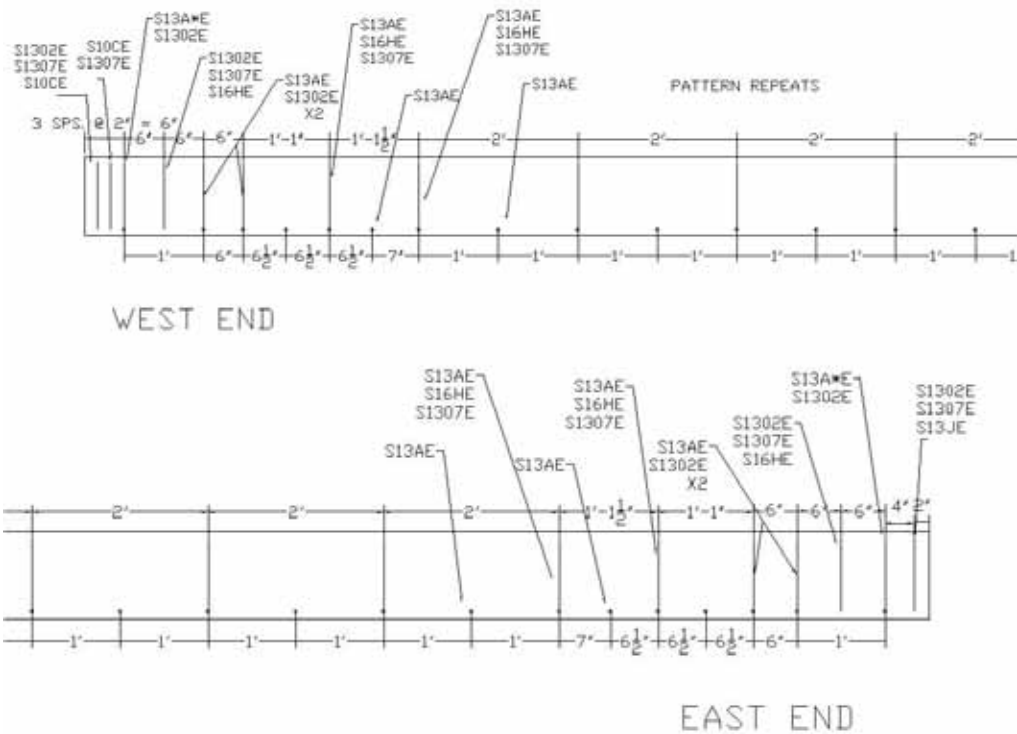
As-built reinforcement layout for Beam 1N (elevation view)
